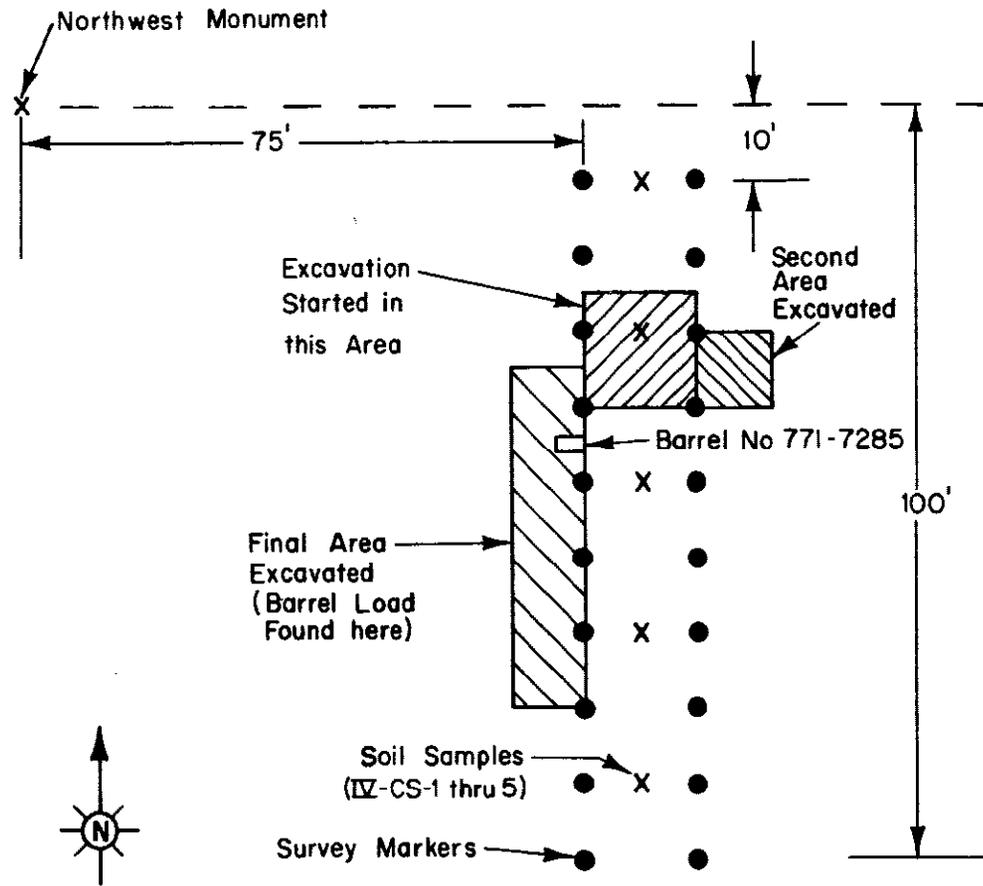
Pit 11 Excavation for special Barrel No. 771-7285.
